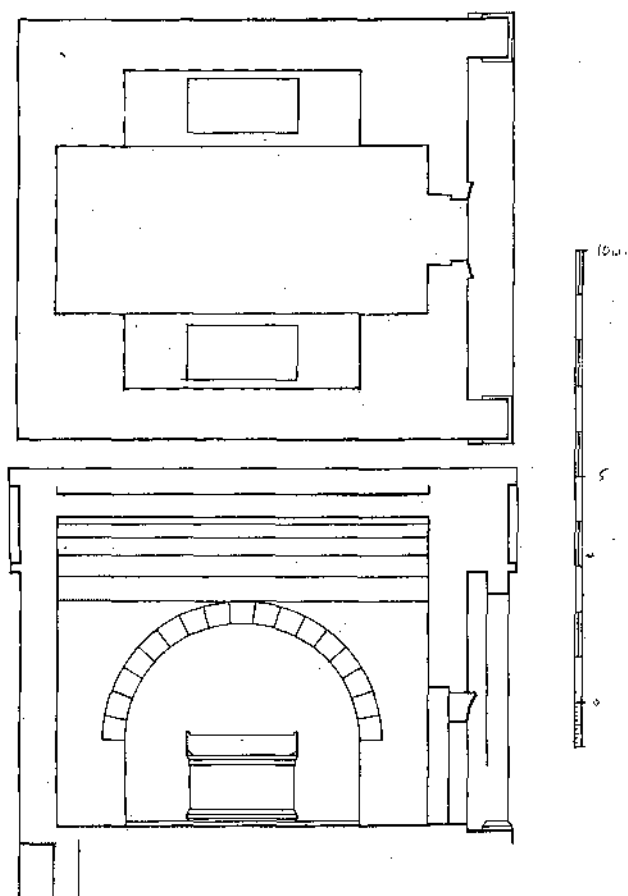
Mausoleum of Licinnia Flavilla plan and section E - W.
